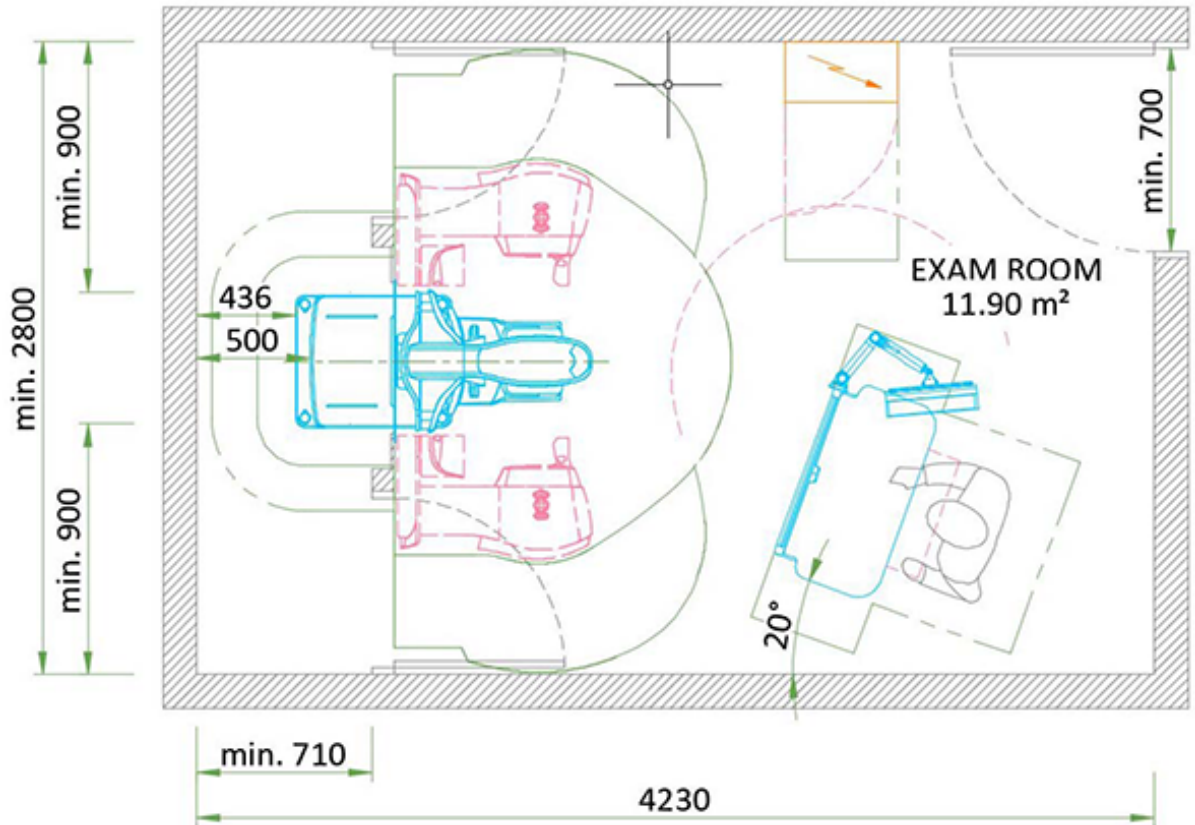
EXAMPLE GANTRY IN WALL LAYOUT
